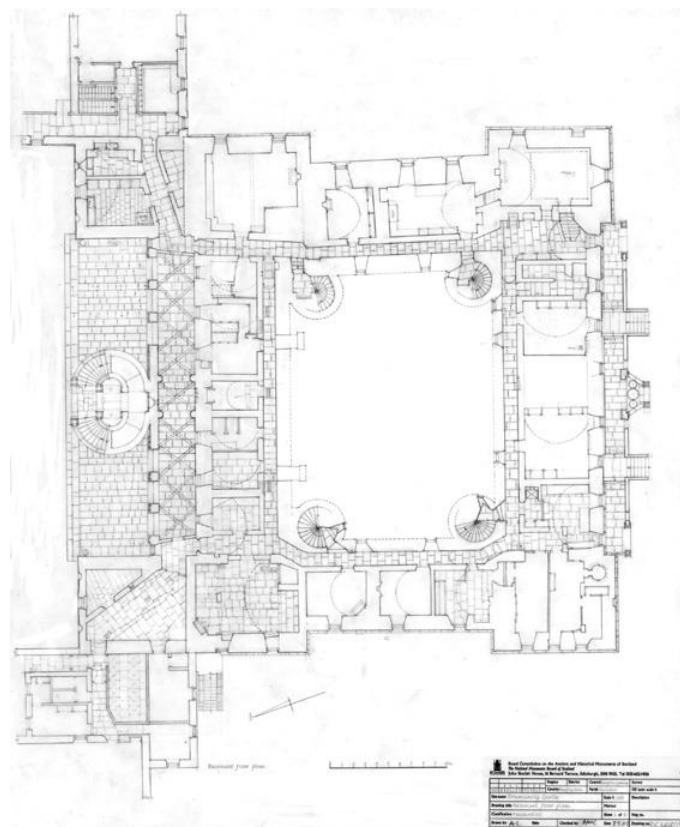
Plan of the basement showing the location of the vaults (RCAHMS)
